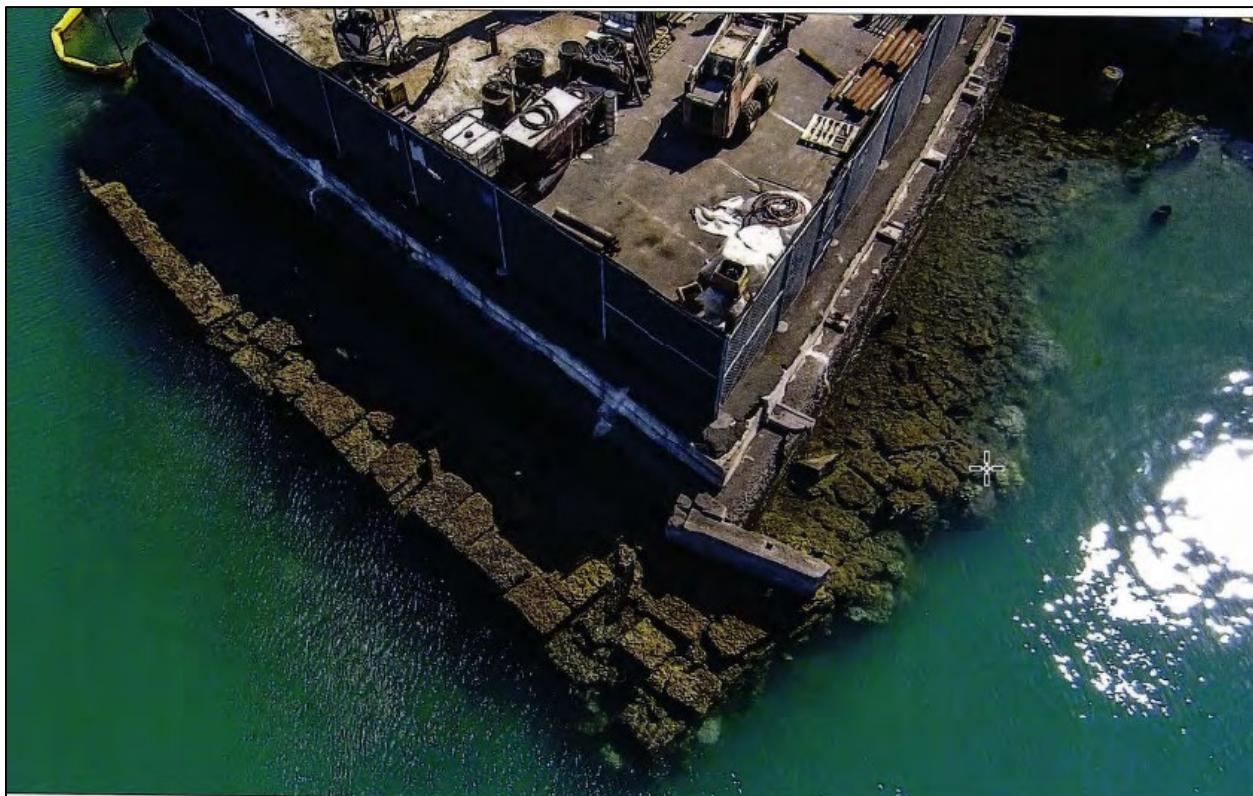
Submerged Cut Limestone Blocks at Pier 12 (Brewer's Wharf)
